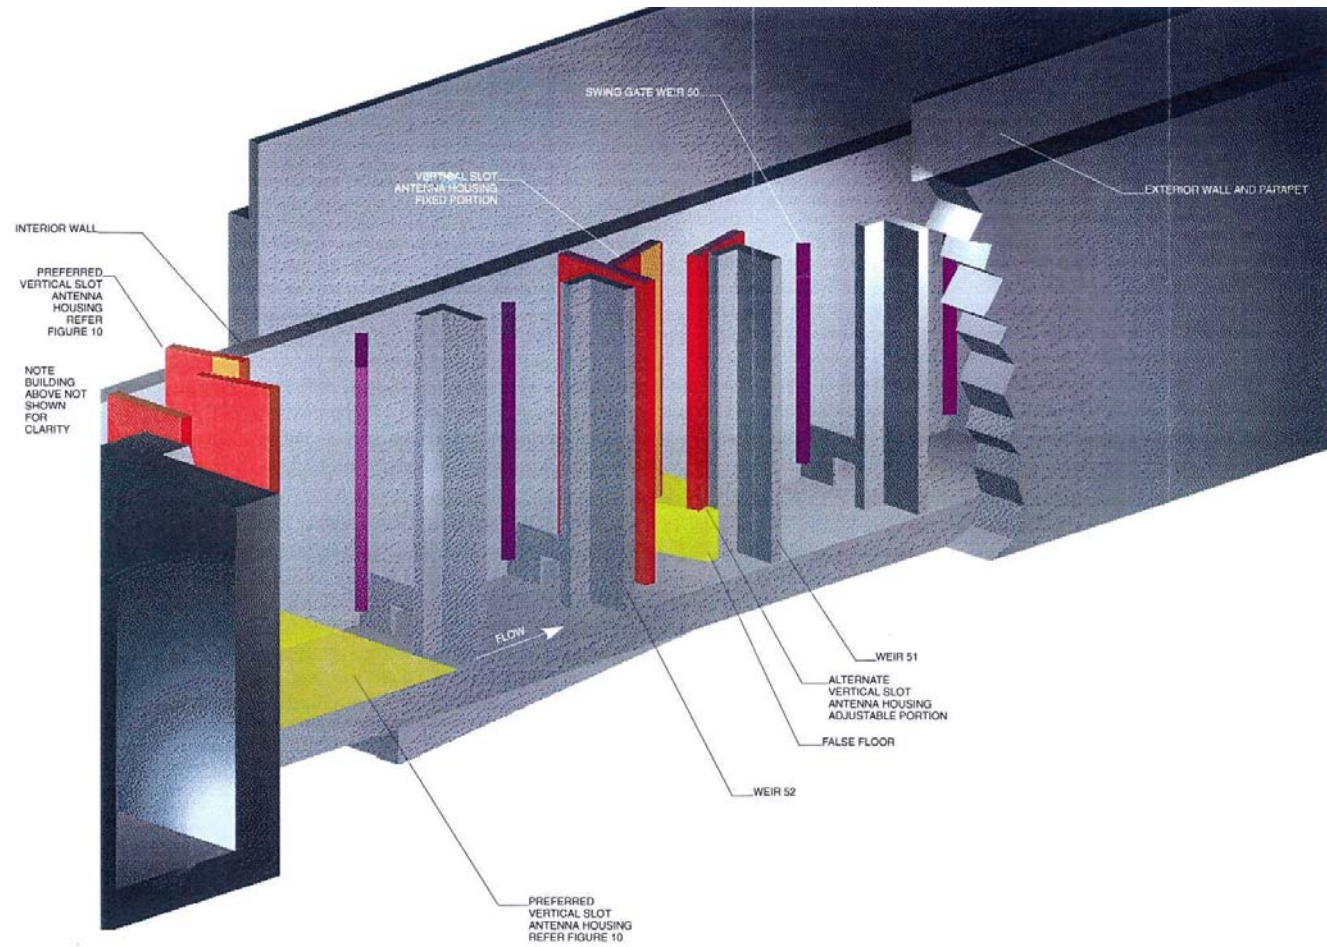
Antenna Housing Installation - Looking through Wall into Pool 51 from Southeast
